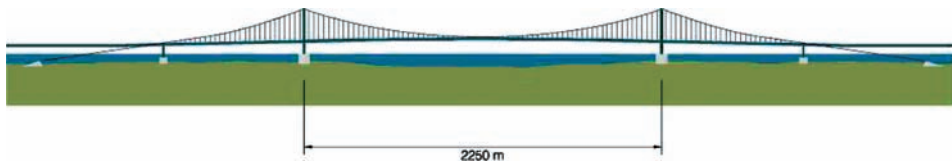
Longitudinal elevation of the Tokyo Bay proposal.
